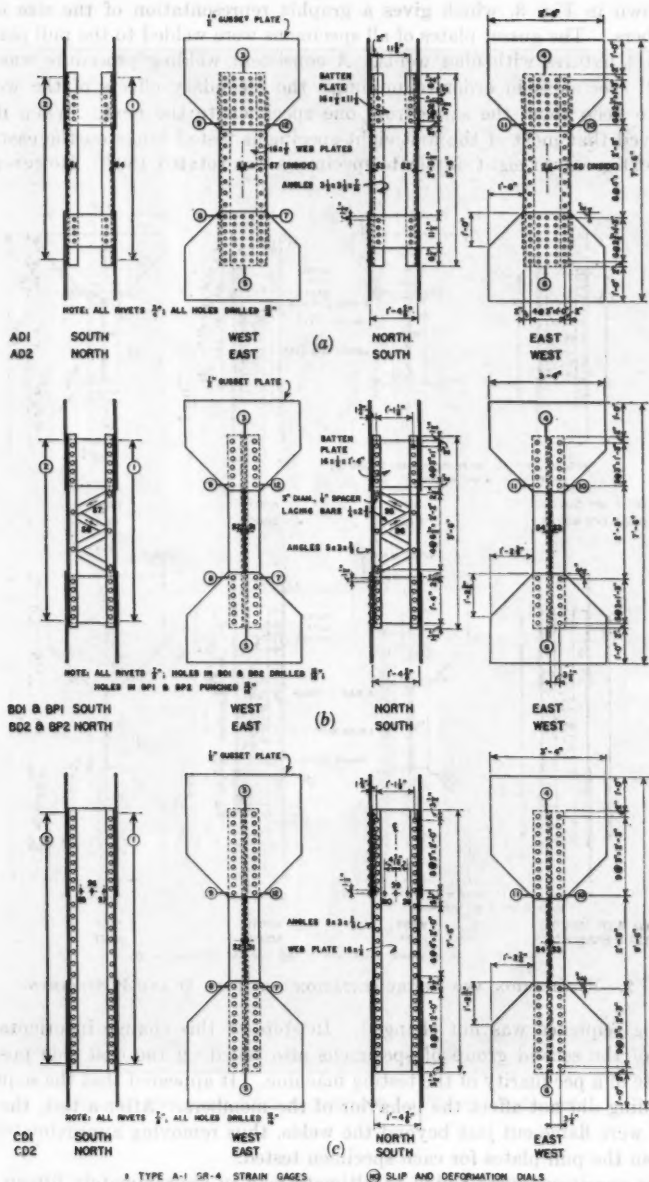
FABRICATION AND INSTRUMENTATION FOR TYPE A, B, AND C SPECIMENS
